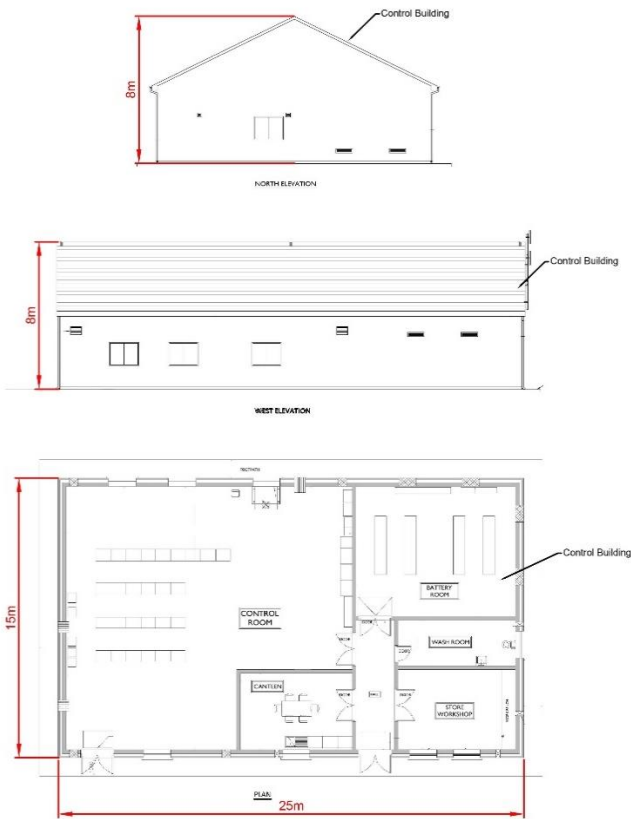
Plan and Elevation of the Control Building at Mountphilips Substation
